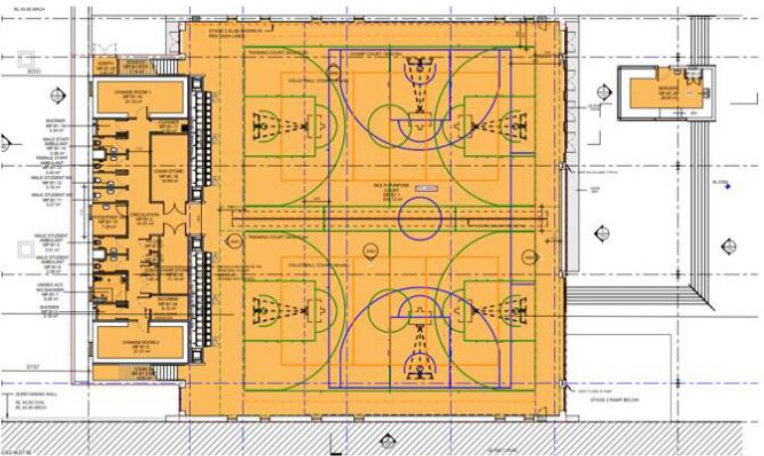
Extended Travel Distance within Multipurpose Pavilion Building (Level 0 - GF)
